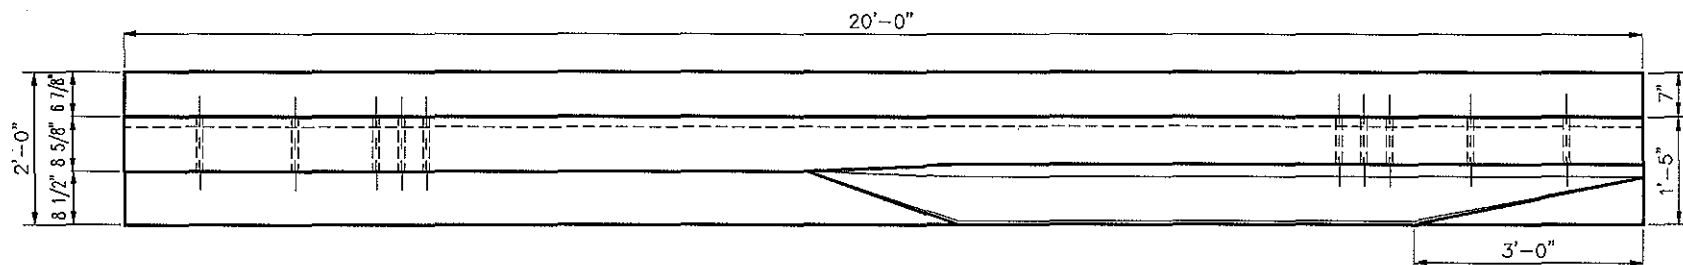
BRIDGE RAIL / ANCHOR BLOCK INSTALLATION
